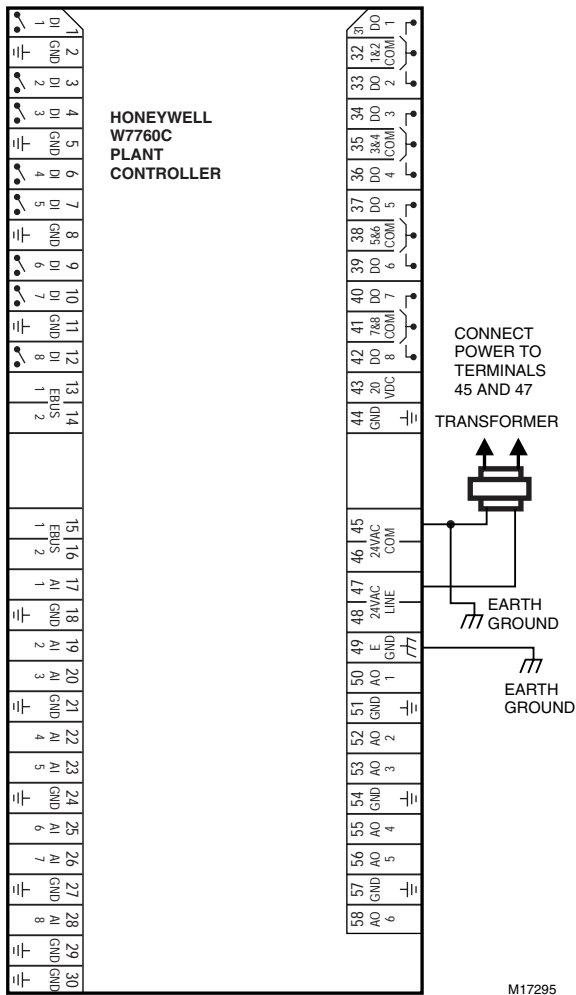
Transformer power wiring details for one W7760C used in UL 1995 equipment (U.S. only).
